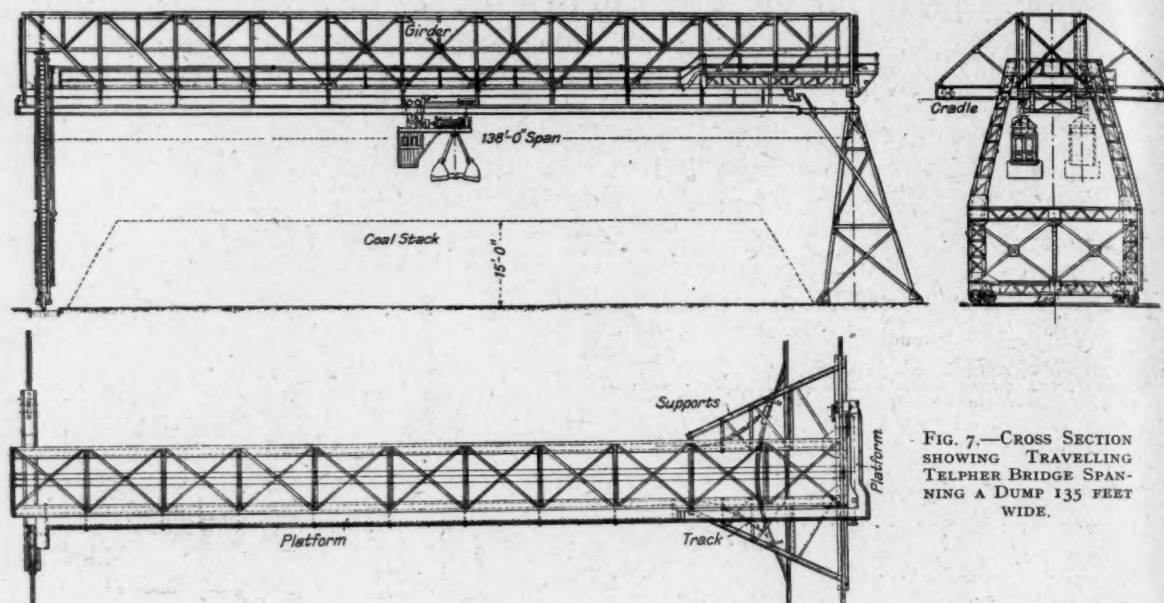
CROSS SECTION SHOWING TRAVELLING TELFER BRIDGE SPANNING A DUMP 135 FEET WIDE.
